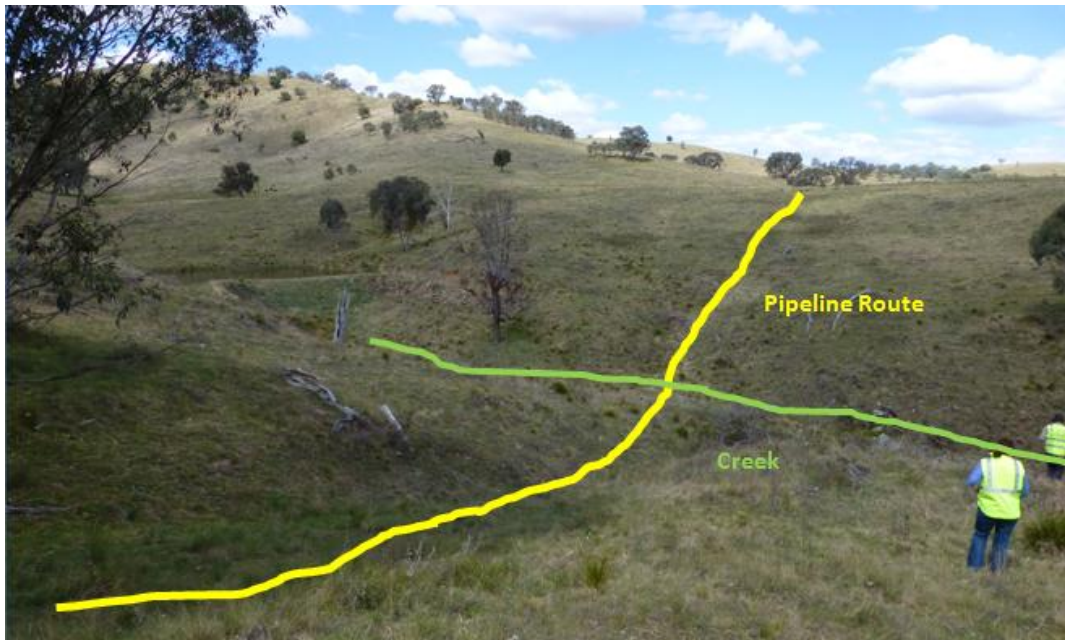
Pipeline route between the offtake and Long Point Road – note broad ridge line and confined valley (no floodplain)
